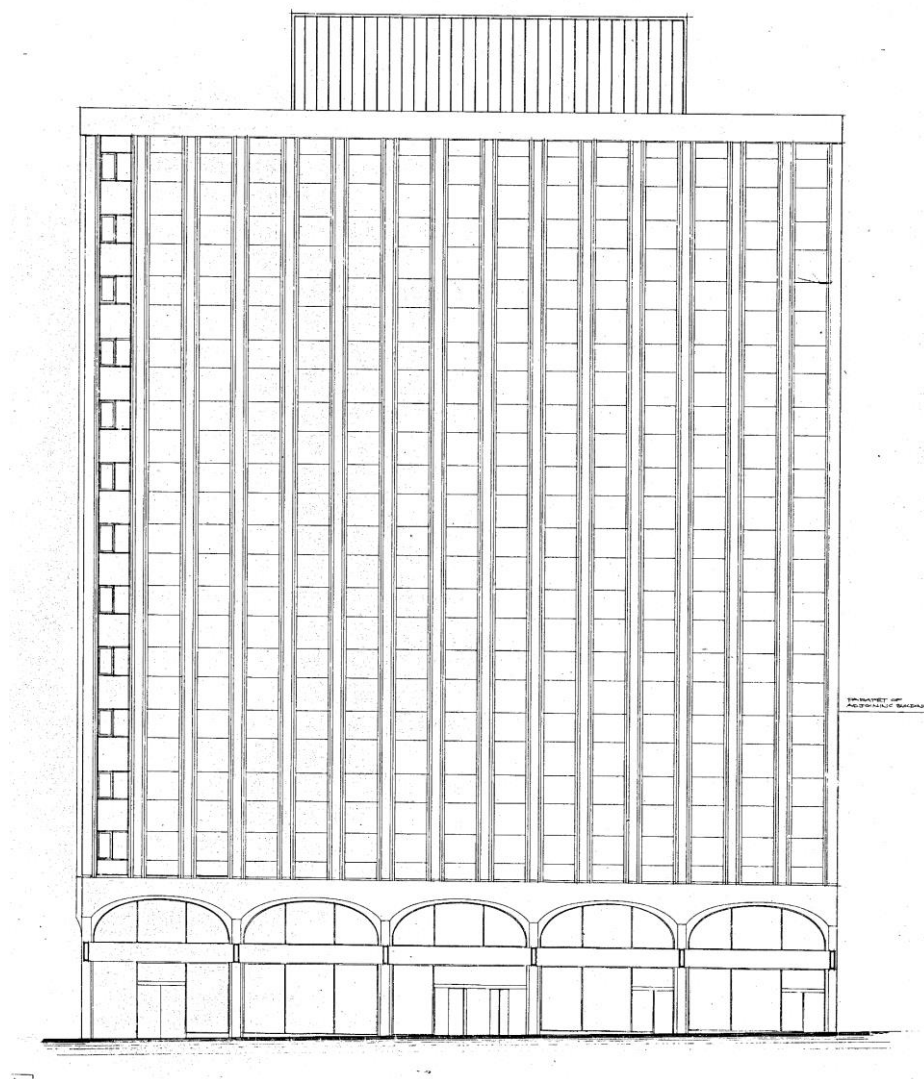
East elevation to Swanston Street. Drawing by Buchan, Laird & Buchan, dated April 1971 (BAP).
